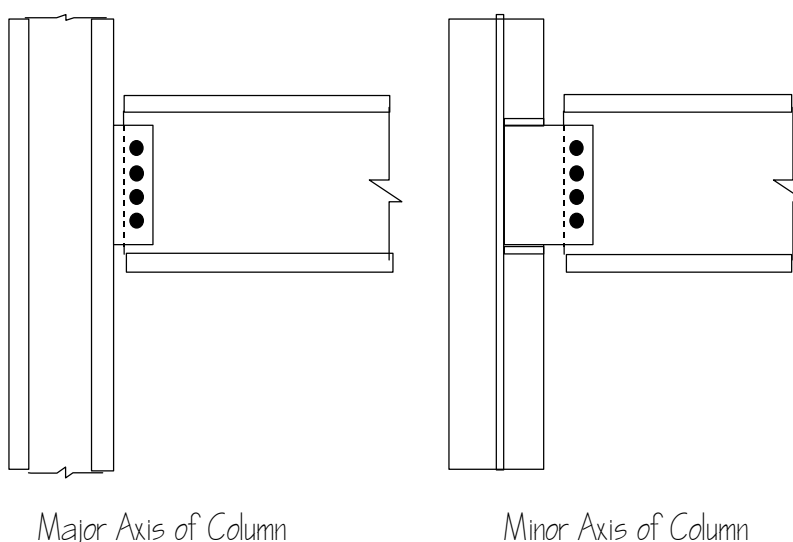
Typical Simple Shear Tab Connection Without Slab
